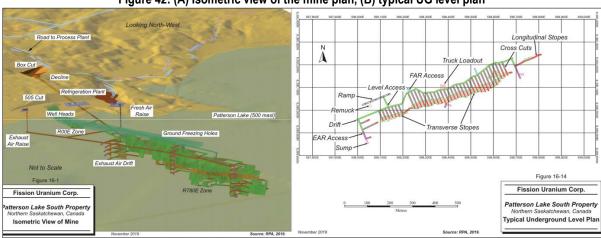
(A) Isometric view of the mine plan, (B) typical UG level plan
